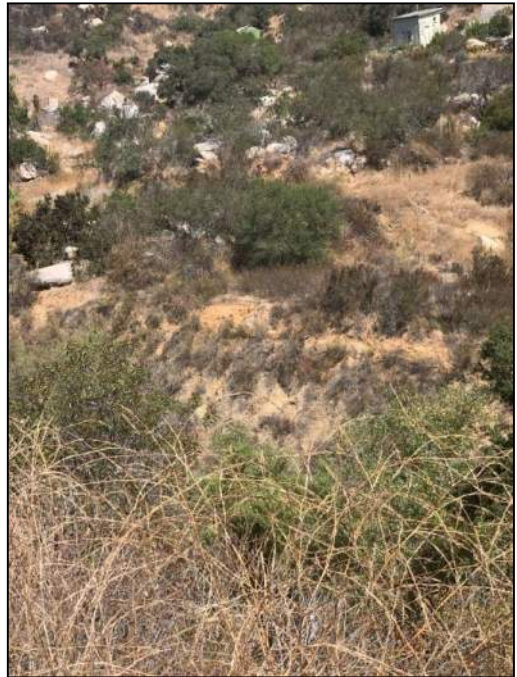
View looking down fill embankment slope on east side of Old Highway 395.
